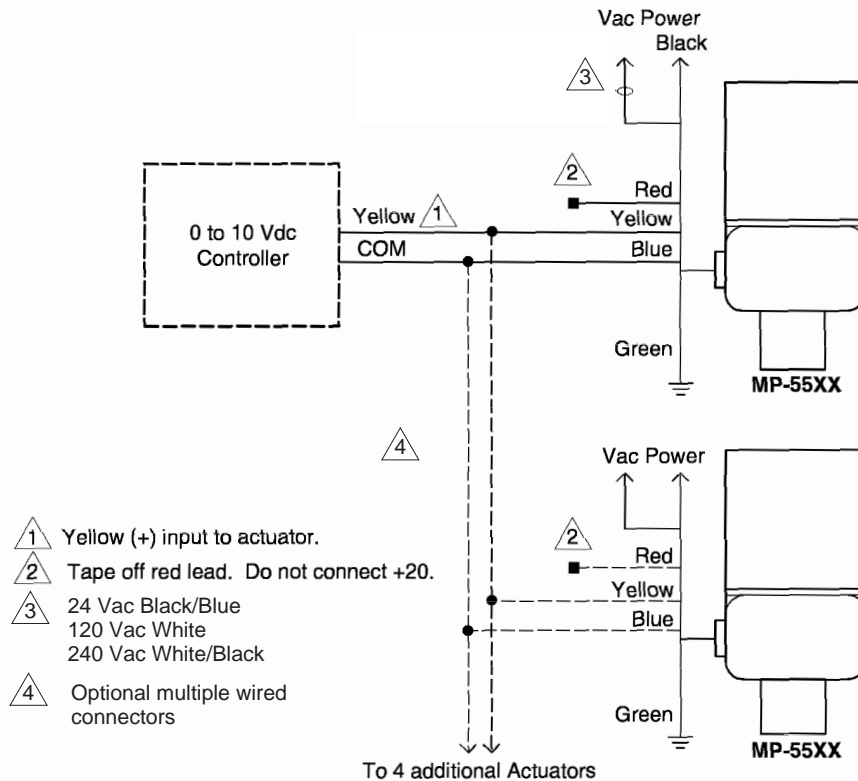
Typical Control Wiring for Up to Six MP-5500 Series Actuators to Controllers That Do Not Require 20 Vdc Power from the Actuator.
